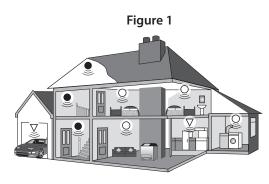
illustrates where smoke and heat alarms should be located in a typical two story house. Note the spacings in "Protection Levels" which ensure the early detection of fire and that the warning will be heard.
